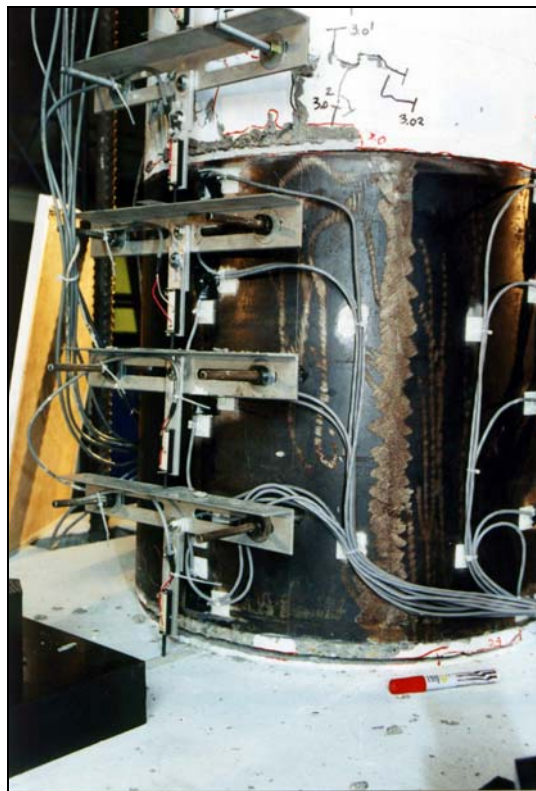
JH1 – Test 1 Crack at column base at 3.0% drift
